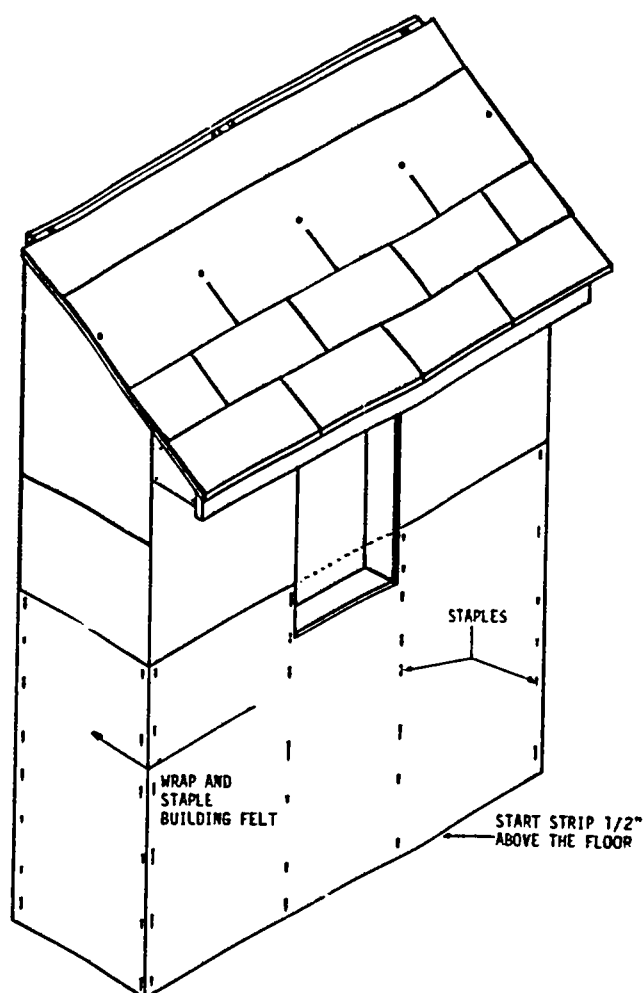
A-2. Bottom Strip of Building Felt Stapled to Front and Side Walls
